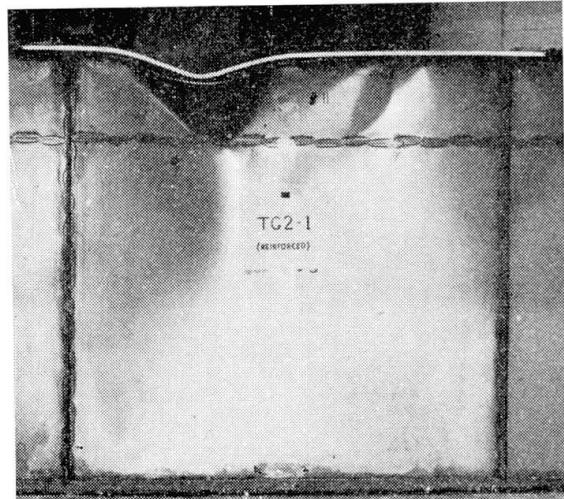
View of girder TG 2-1 after test to failure.
